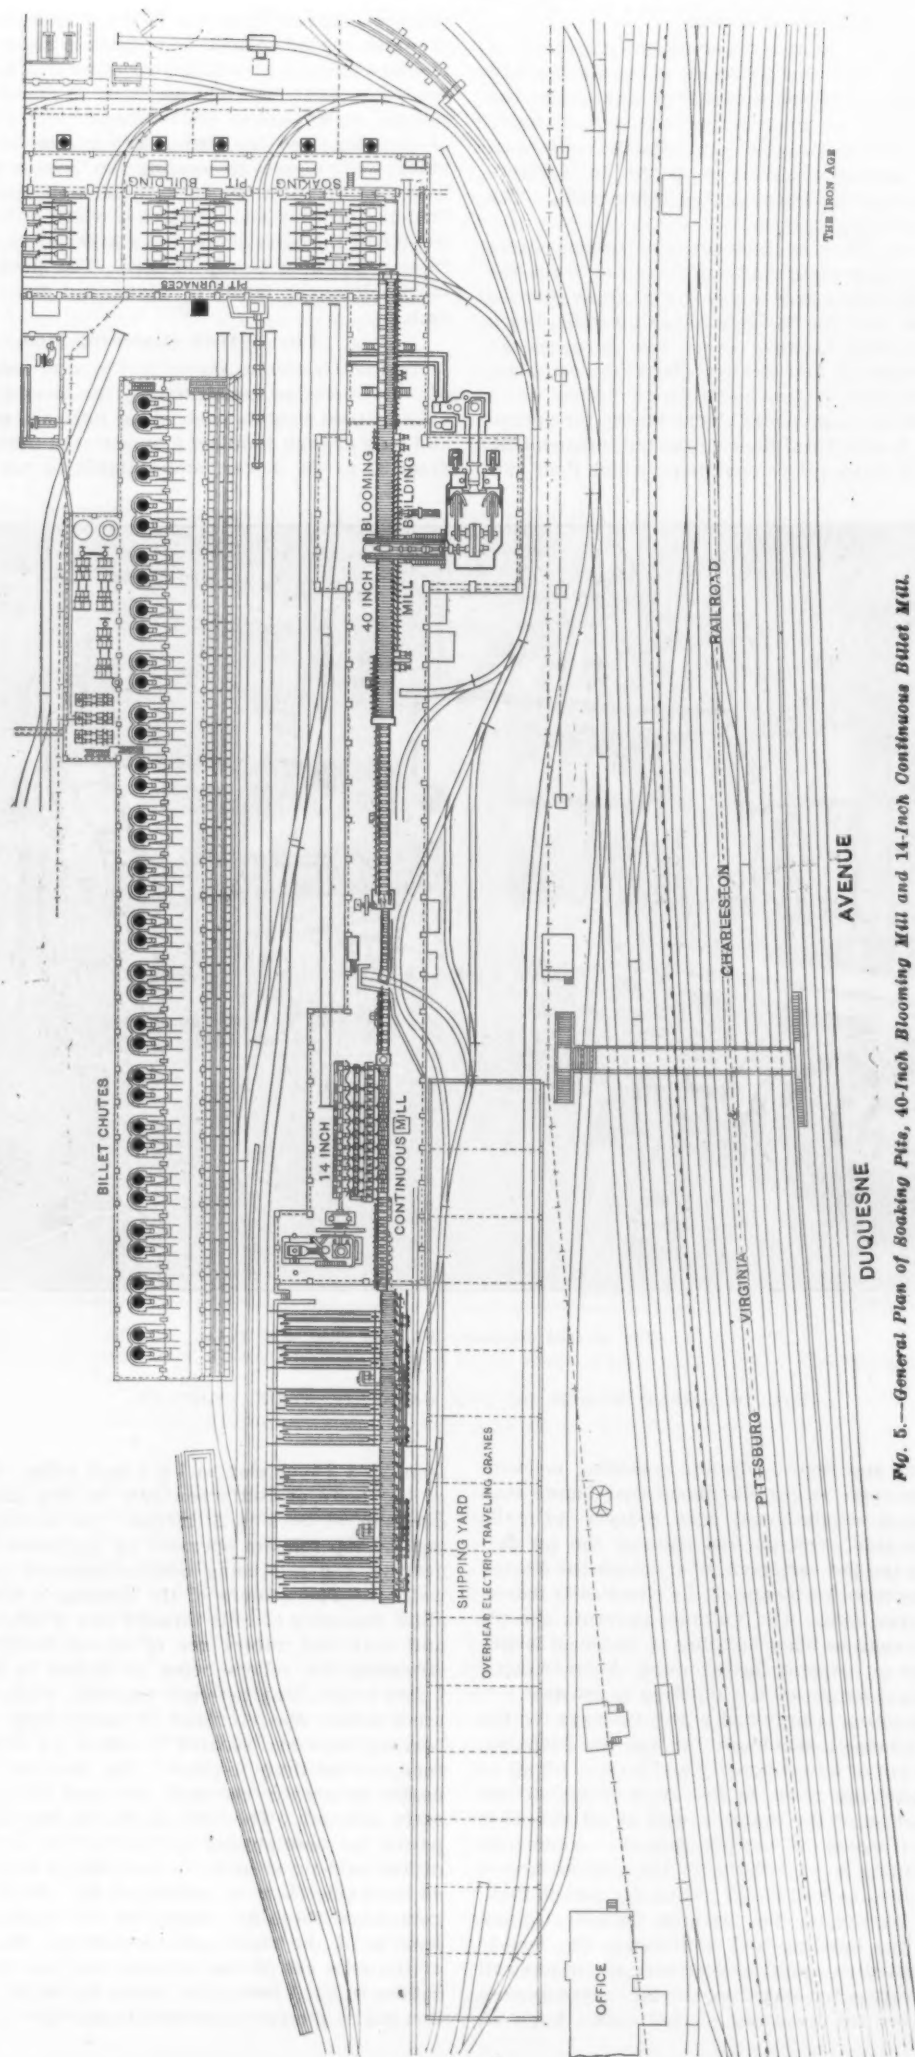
General Plan of Soaking Pits, 40-Inch Blooming Mill and 14-Inch Continuous Billet Mill.
